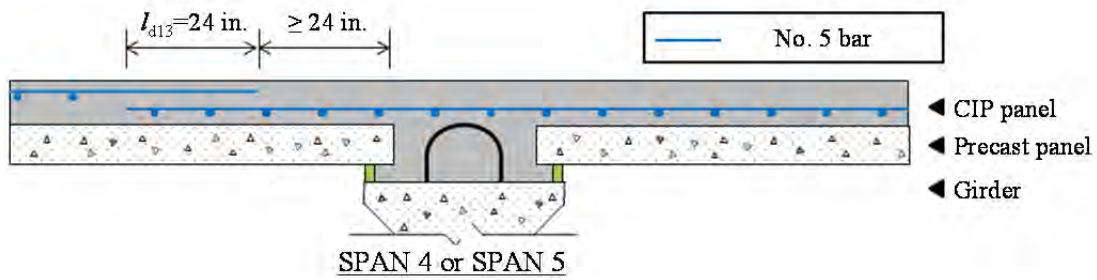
Details of transverse splice, Lampasas River Bridge (Section P-P)
